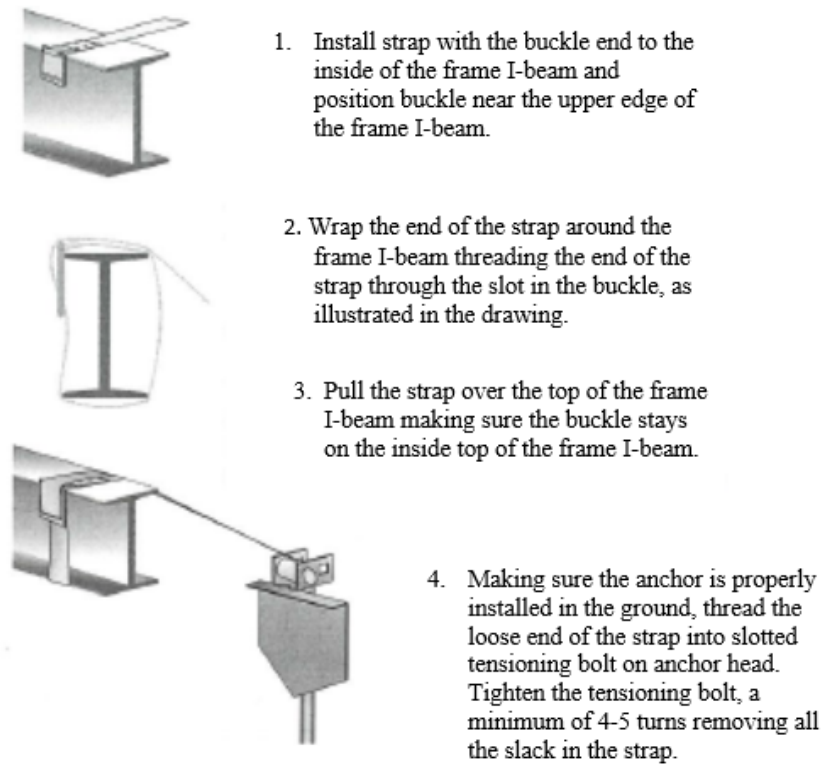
Installing Frame Tie Strap Using a Double Slot Strap Buckle
